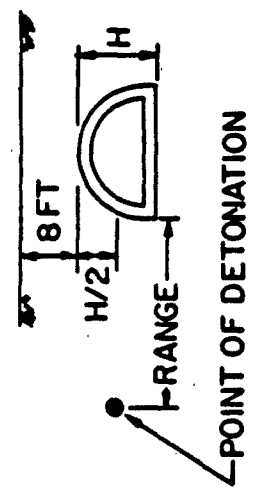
WALL DESIGNS FOR DOME SECTION.
